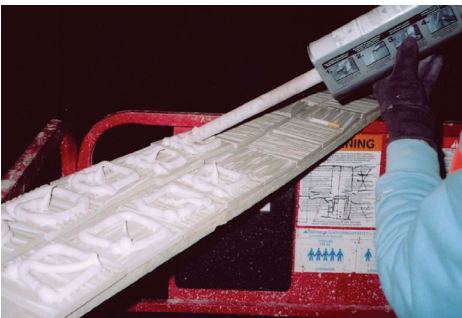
Installation of Exterior Rated Ceramic Wall Tiles on the Ceiling of the Route 9A, New York, NY Roadway Tunnel Utilizing the Epoxy Spot Method — LATAPOXY® 310 Stone Adhesive
